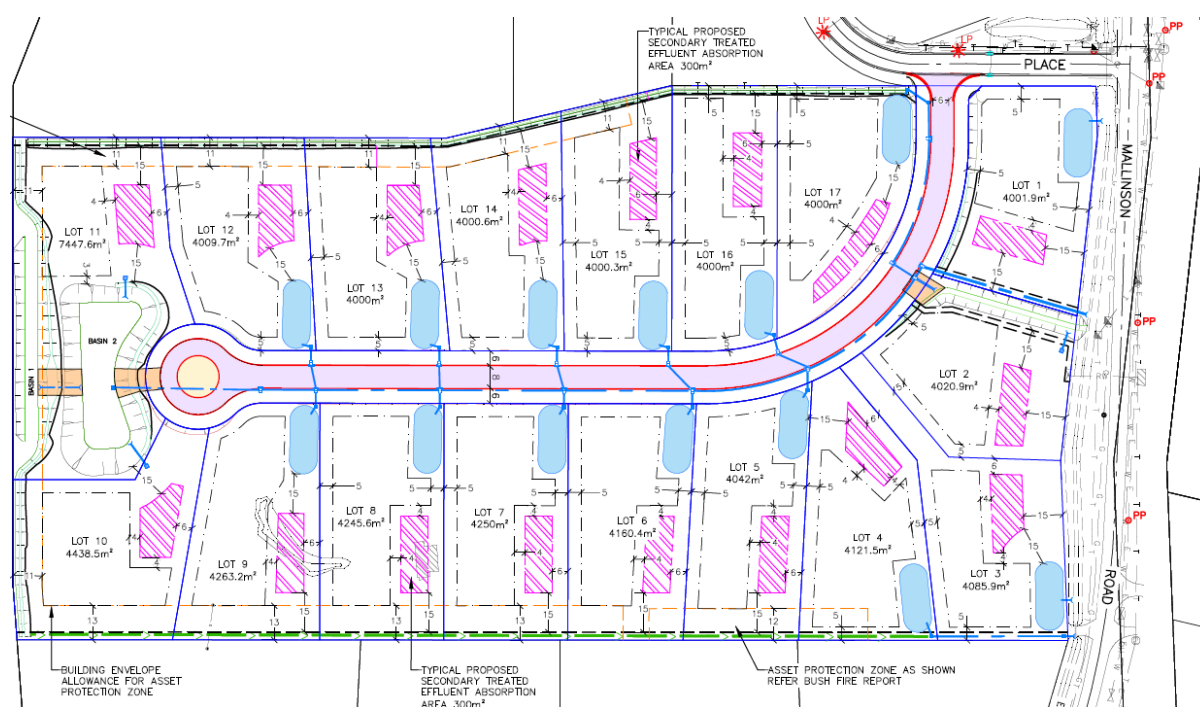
Subdivision plan indicating lot layout, building envelope, detention basins and on-site sewerage management area.
